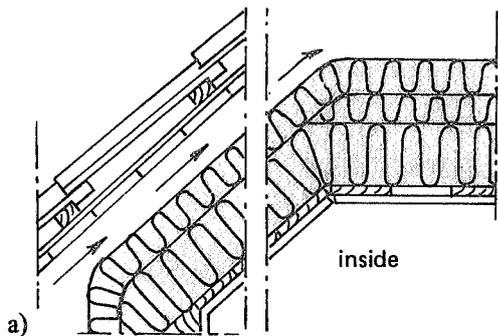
Insulation and airtightness defect in inclined ceiling due to bad fitting and incorrect placing of insulation material onto warm side, and to leakage of air into the construction.
